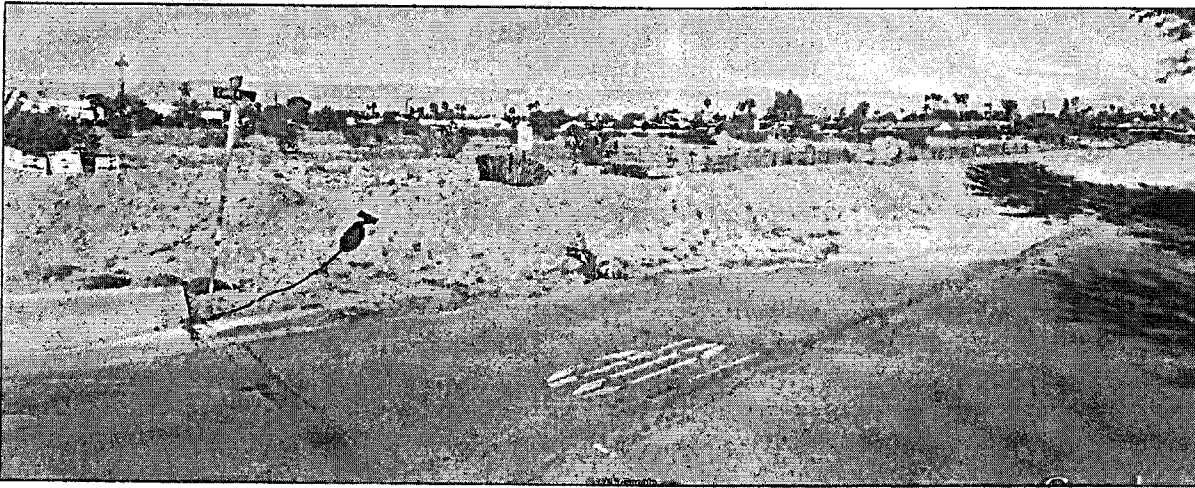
Existing Conditions-View from Corta & Landau, Looking Northeast
